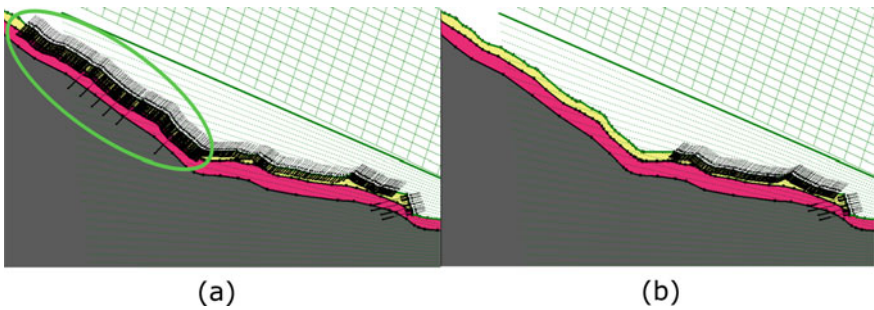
Section 1 a After, b before after the required stabilisation
